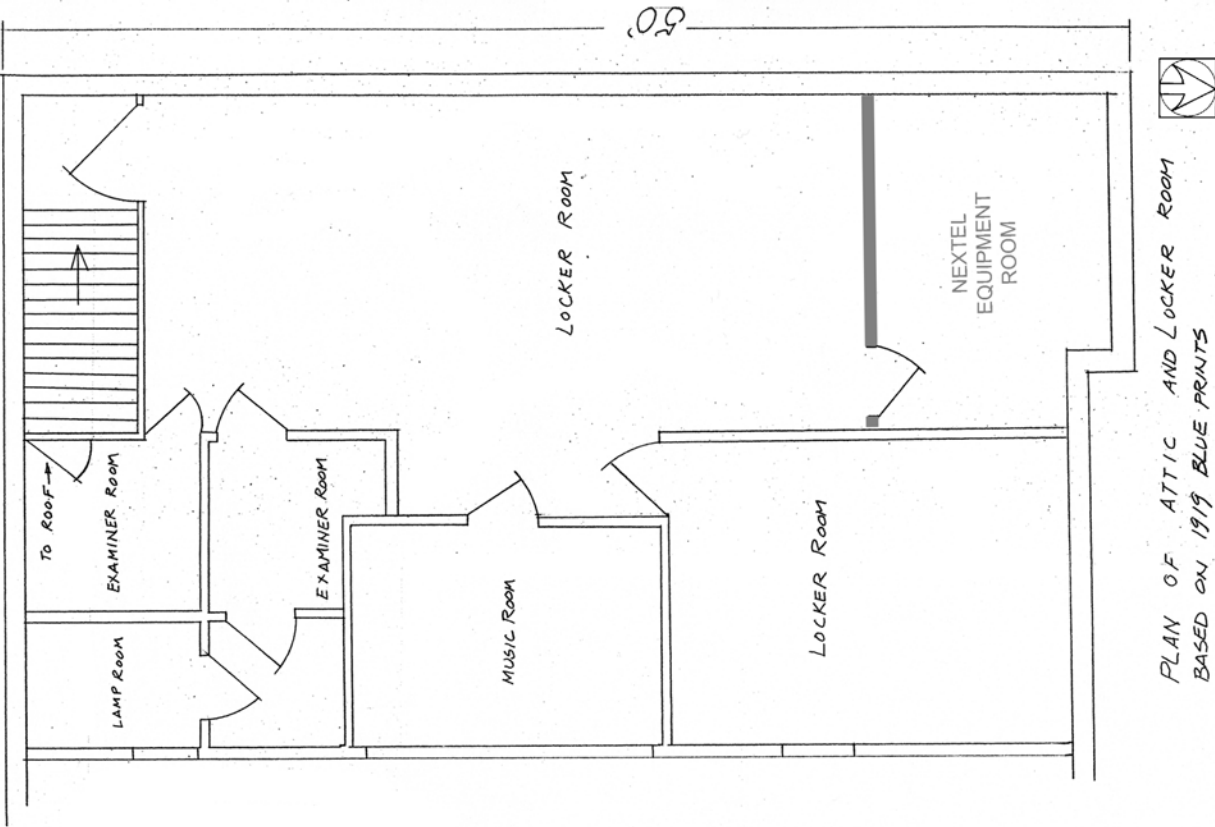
Attic plan with current wall configuration over Sunde's original 1919 drawing for the Sunnyside Masonic Lodge in Portland.
